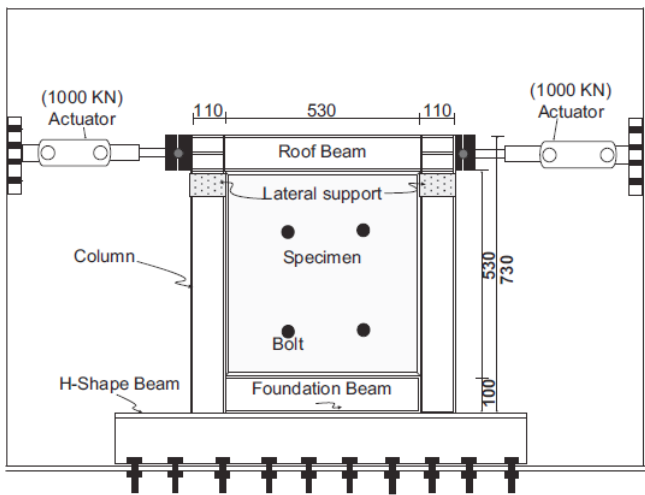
Dimensions details and loading of Arabzadeh and et al. test [3]
